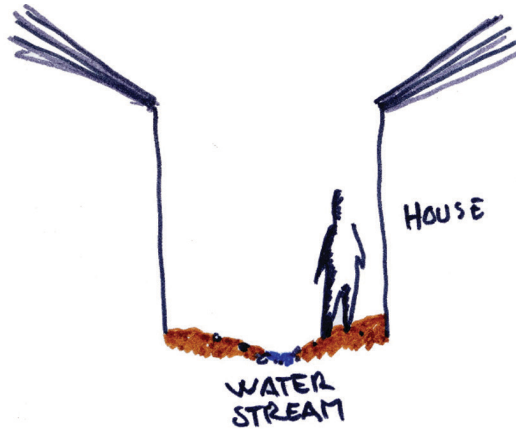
Mathare, Nairobi. Houses are built on natural elevations and water drips down the hill
